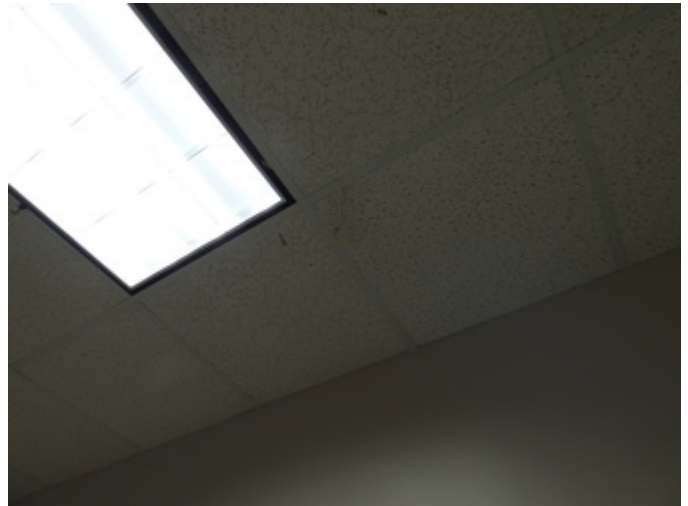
shows drywall damage. Photo 4 is dark, indicating a fresh leak.
